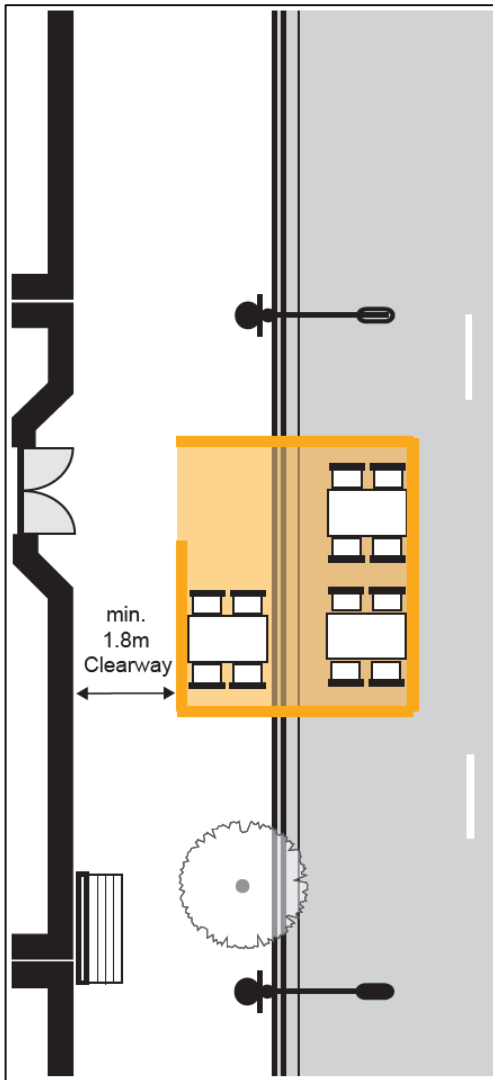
Boulevard and On-Street Combination<sup>6</sup>
